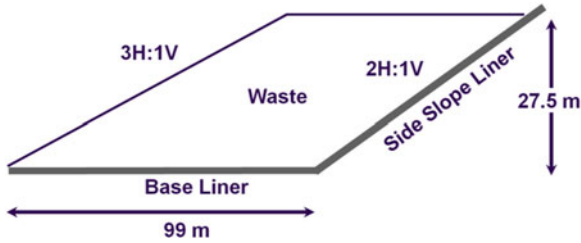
Cross-section through Kettleman Hills Landfill before slope failure
